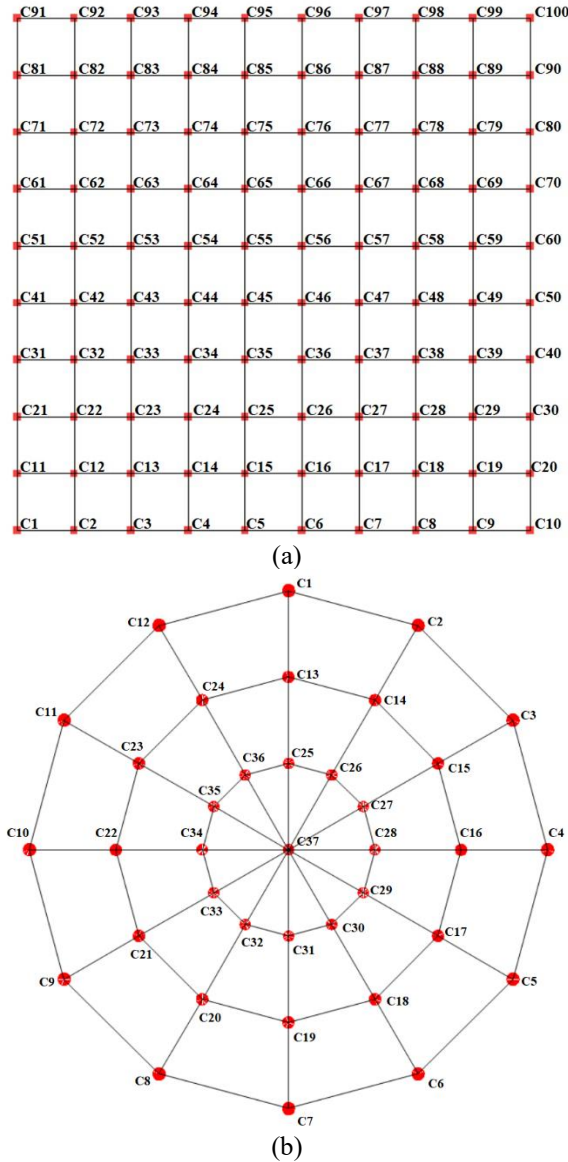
Column layout in plan for (a) rectangular and (b) circular models
